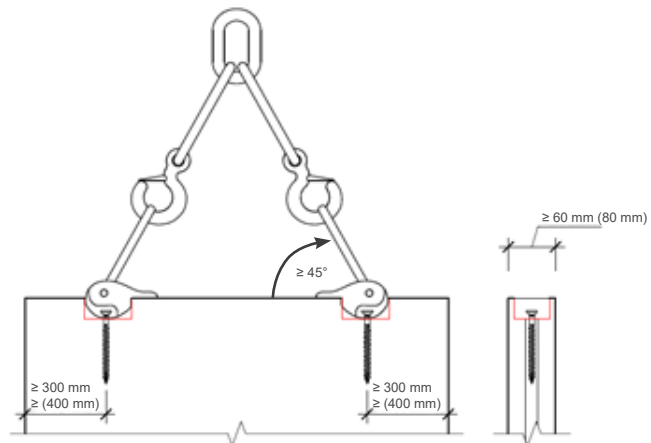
exclusively axial screw loading through applying exact plug hole valid for d = 12 mm (d = 16 mm)
